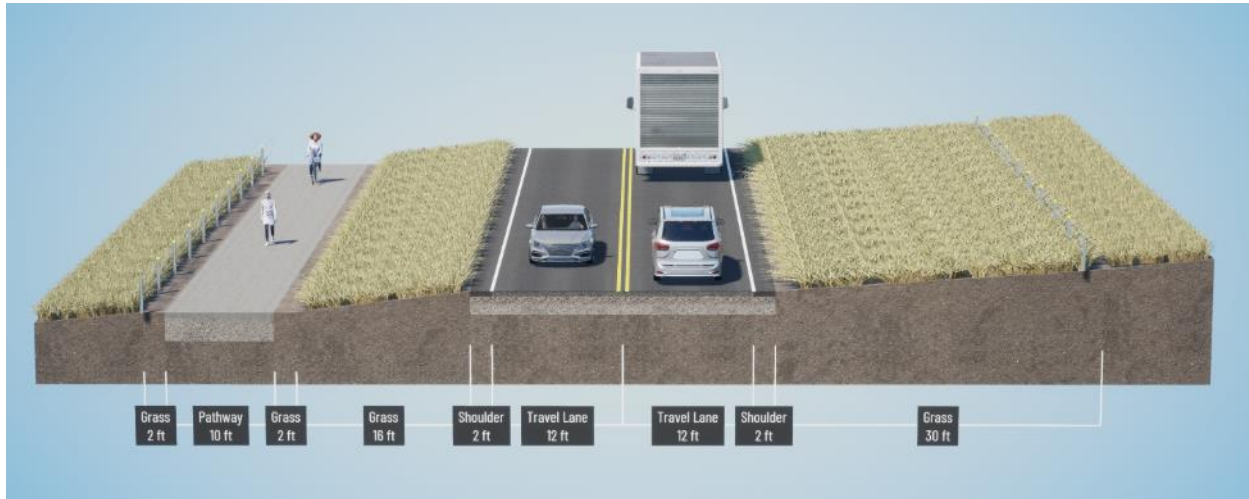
Proposed Typical Section of Beacon Hill Road with Paved Pathway
